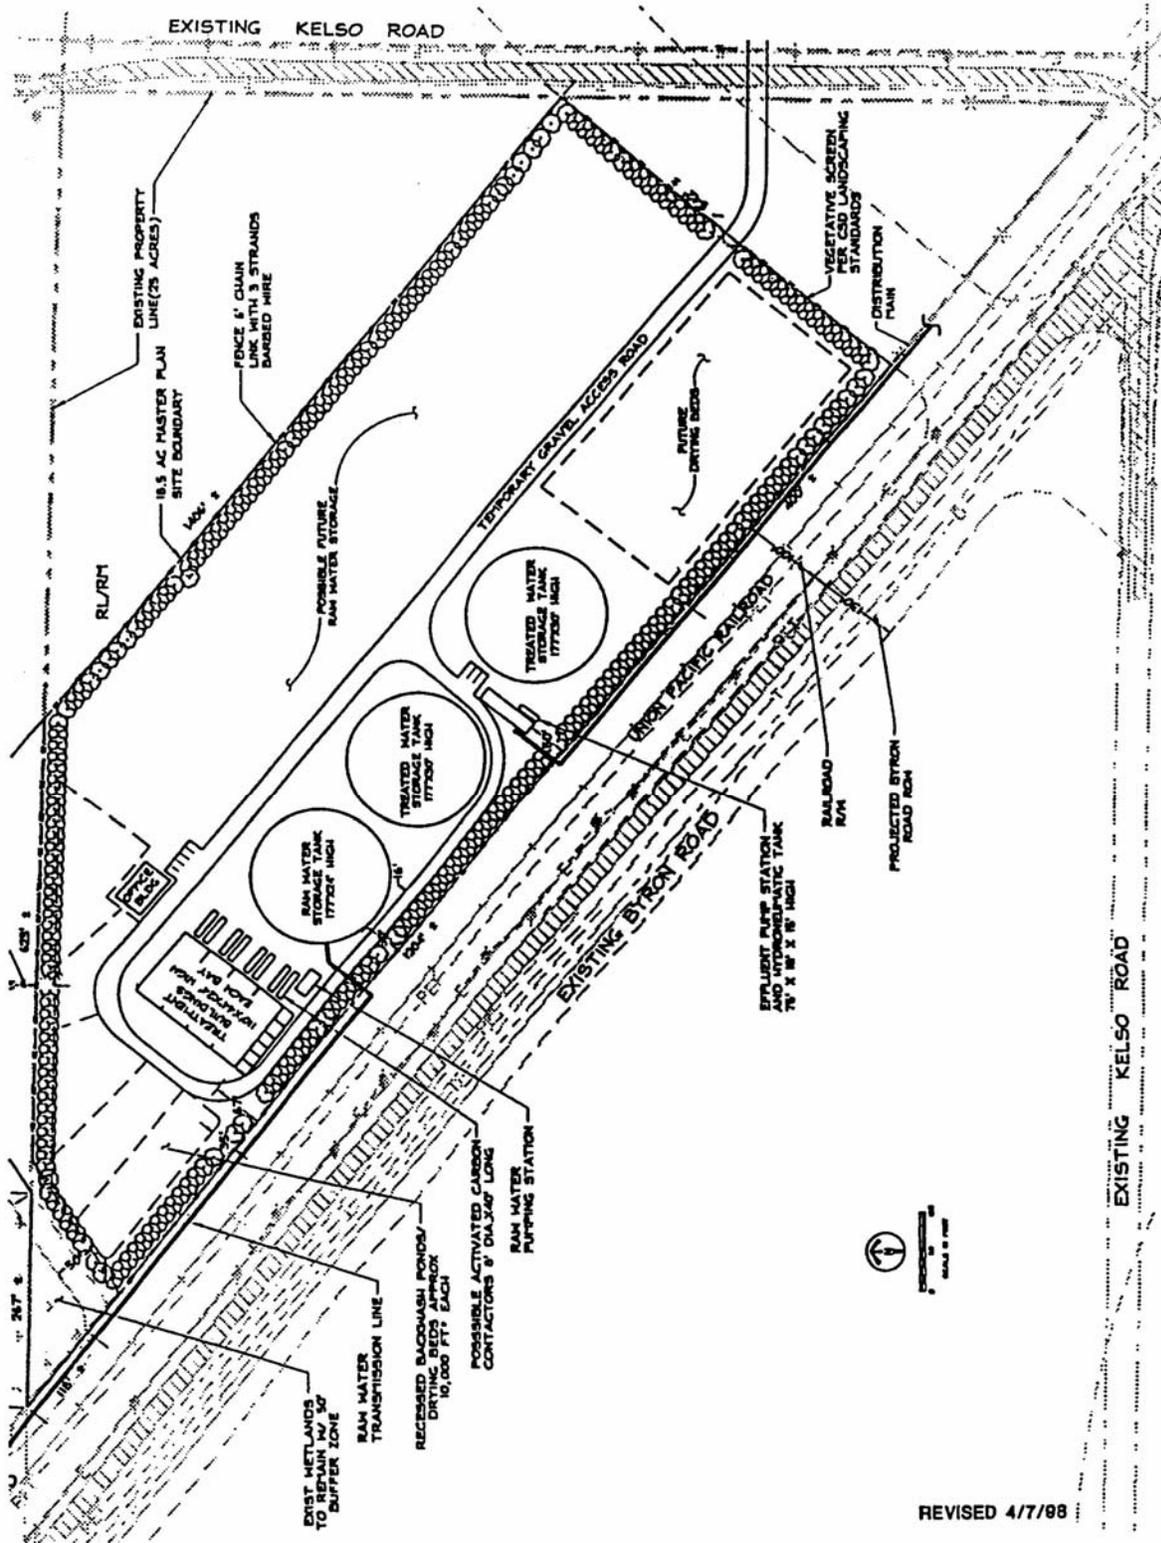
WATER TREATMENT PLANT SITE LAYOUT
